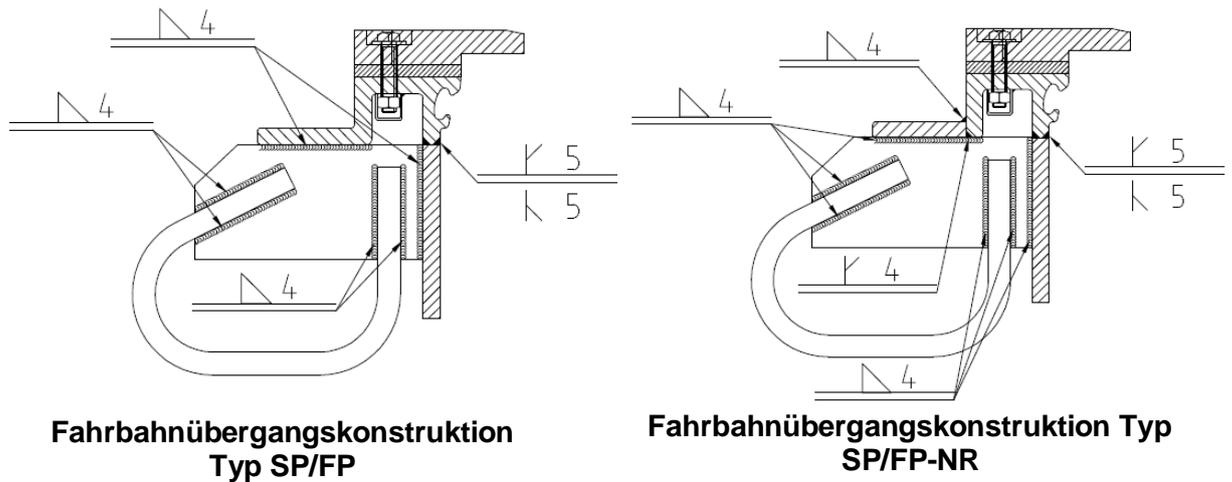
Dimension and type of welds according to EN ISO 2553
